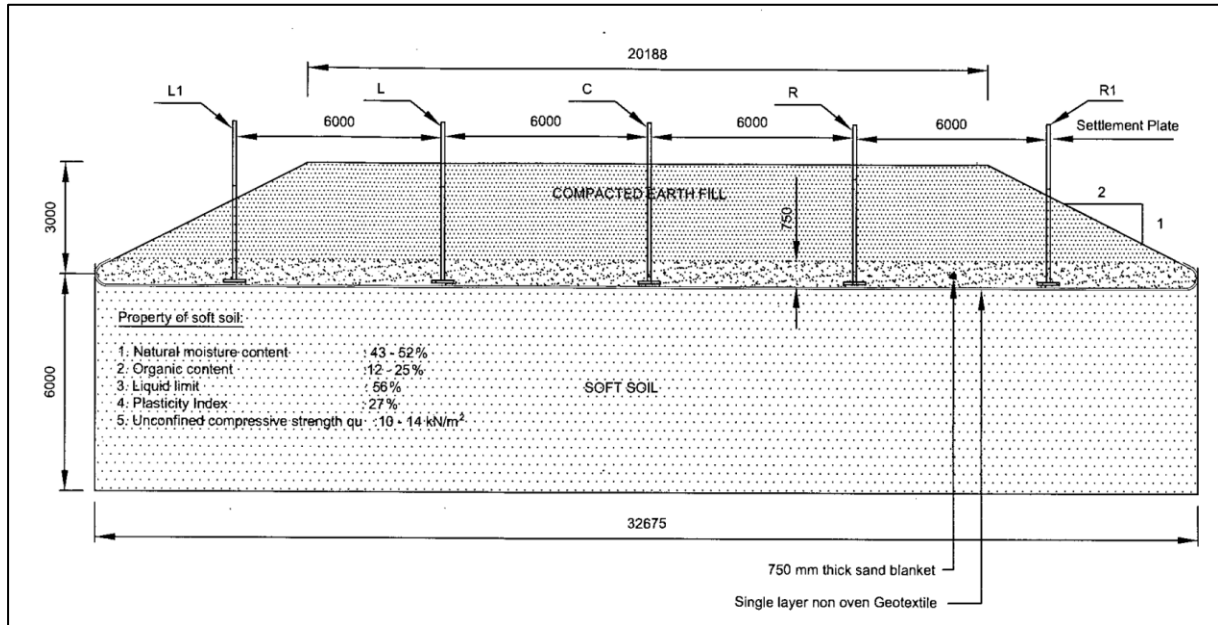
Typical cross section of the Saga trial embankment ( Hoque et al., 2004)
